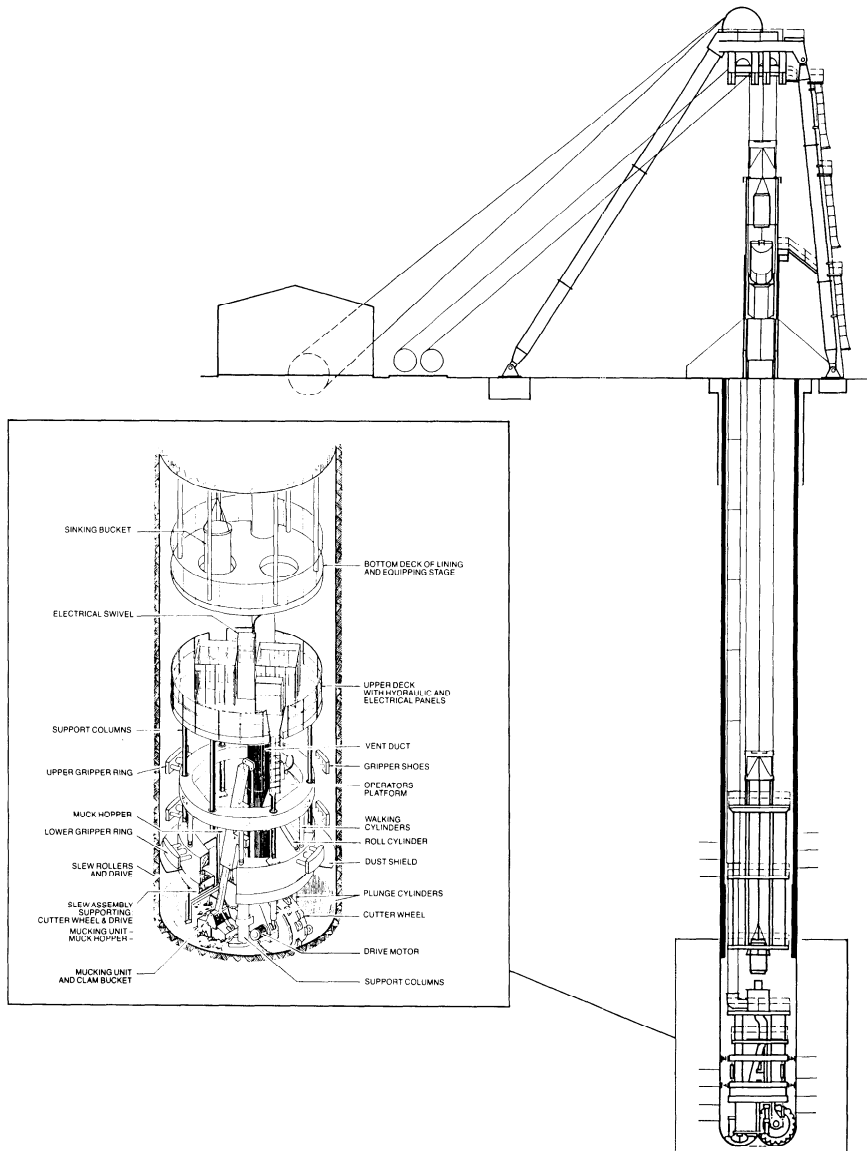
Robbins shaft boring machine (courtesy: Robbins Co.).
